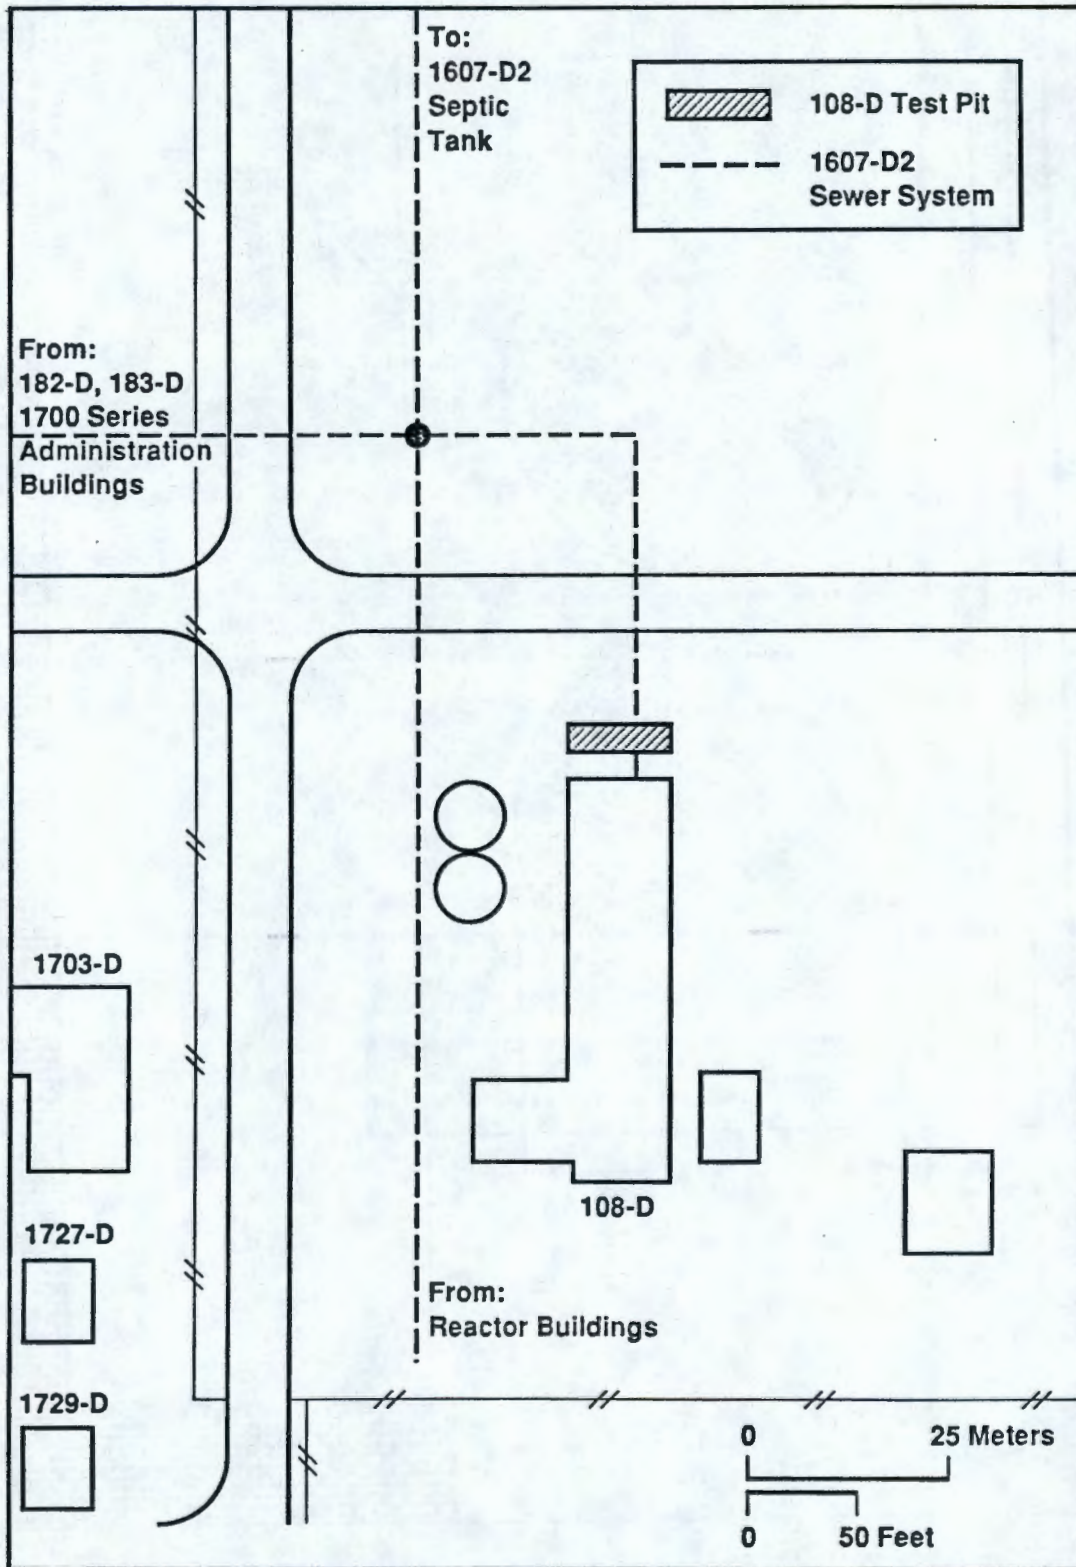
100-D Area 108-D Building, Associated Structures and Test Pit.
